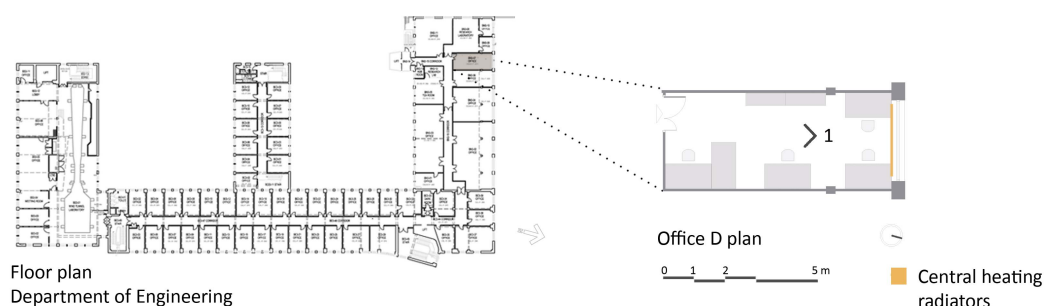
Office D floor plan and its location within the Engineering Department.
